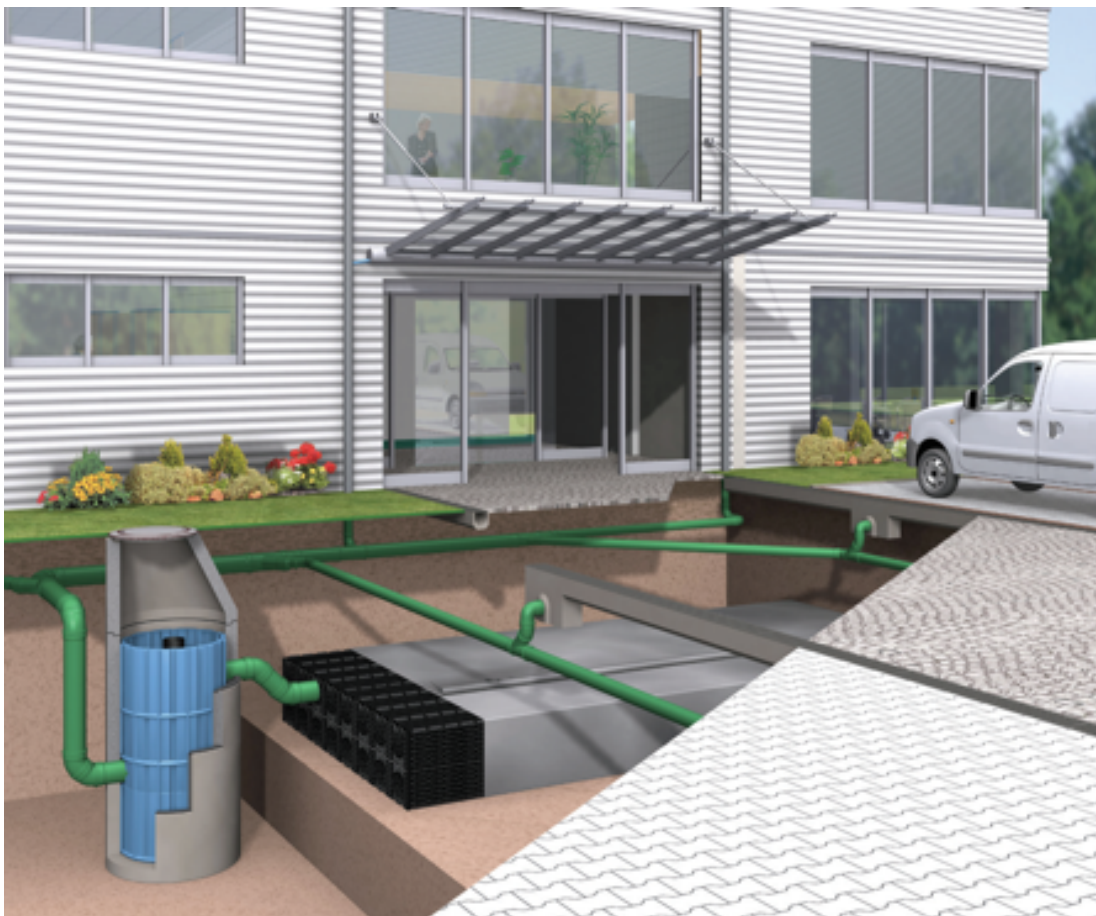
Hydrosystem 1000 in front of an underground infiltration facility
